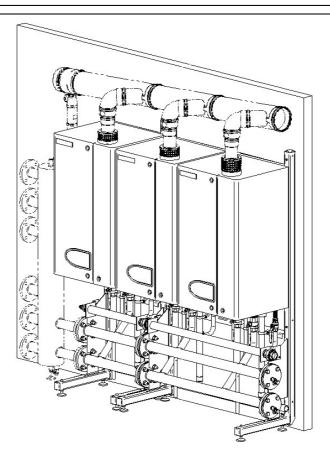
Three boiler arrangement showing boilers, single & double boiler frames bolted together, optional 6 port low loss header, optional flue header, water & gas pipe work for 120kW, 150kW, 180kW, 210kW, 255kW, 375kW, 450kW boiler outputs.
